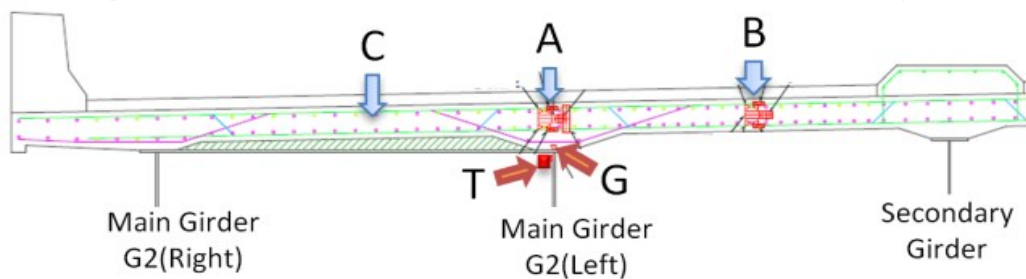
(f) Locations of measurement (A: directly connected with main girder and B: in flexural part of RC slab) in the Shinkesen Ohashi Bridge deck RC slab
